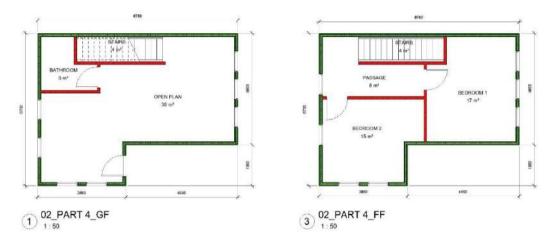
Ground and first floor plan of IBT system 4 scenario (By Author, 2023)
